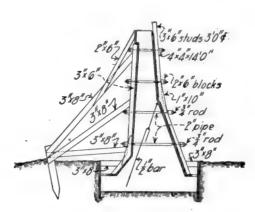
Forms for Retaining Wall, C. B. & O. R. R.
